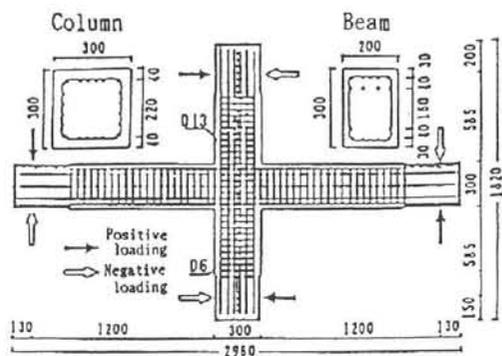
Arrangement of Reinforcement (OKJ-1)
